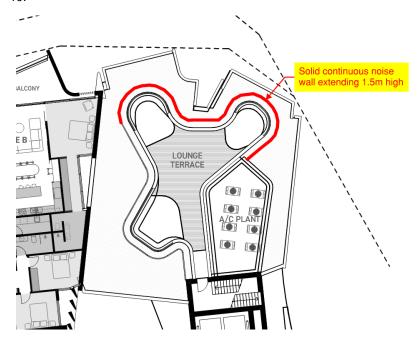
Communal level 12 outdoor lounge terrace noise wall location
